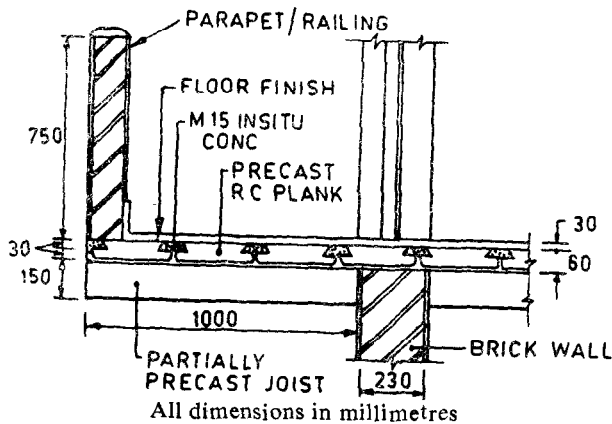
TYPICAL SKETCH OF CANTILEVER ALONG THE JOIST FLOOR LEVEL
